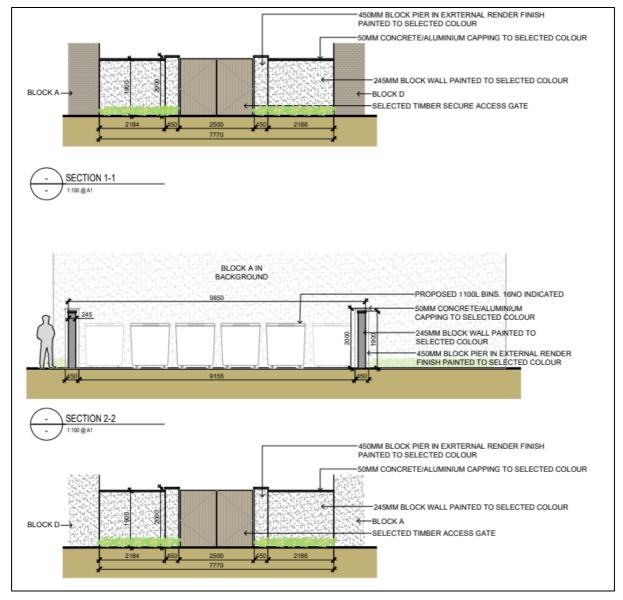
Elevations of proposed bin store (FHP Design Statement)
